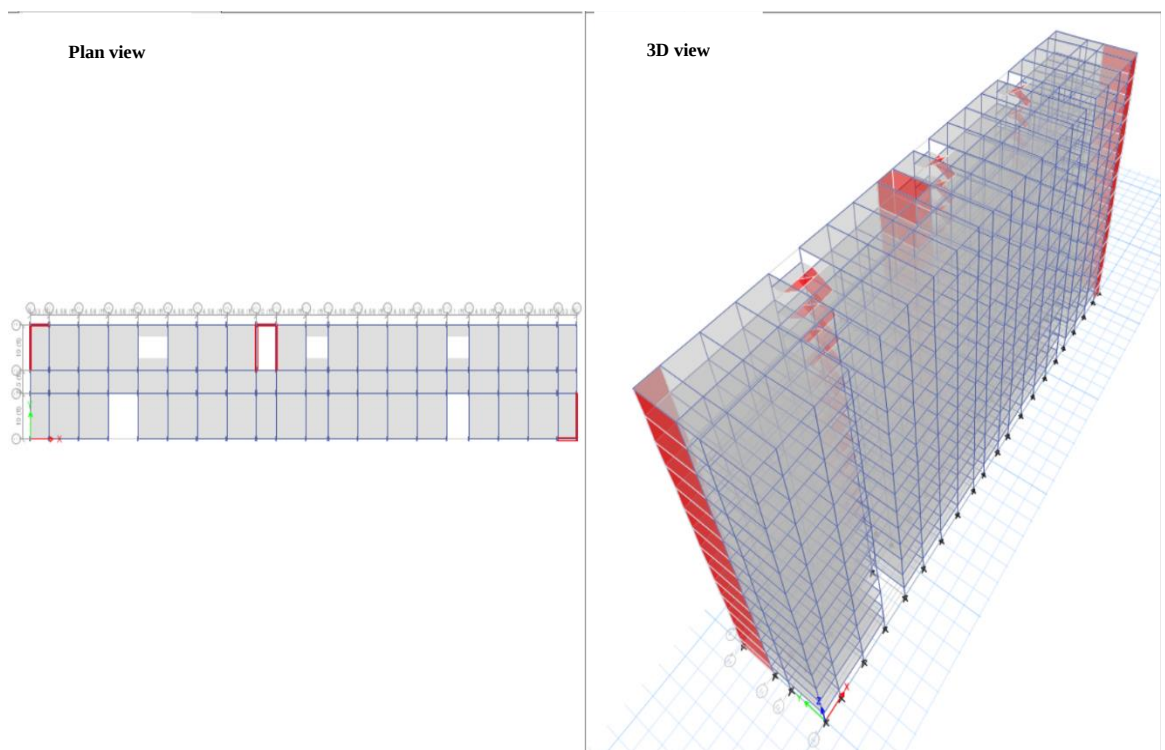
Case D (Building shear wall at two side diagonally upper left and lower right)
